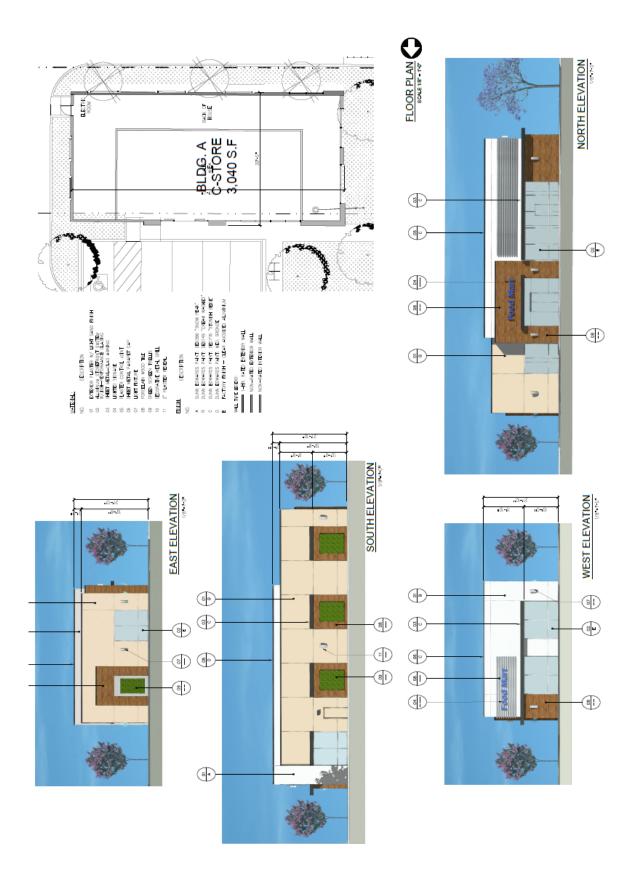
FLOOR PLAN & ELEVATIONS
